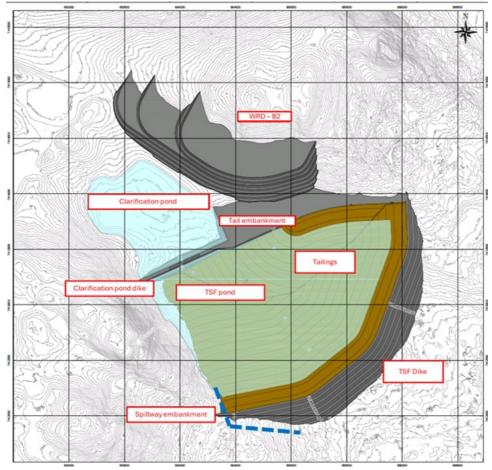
Plan view of the waste rock dump and the tailings storage facility with associated water ponds.
